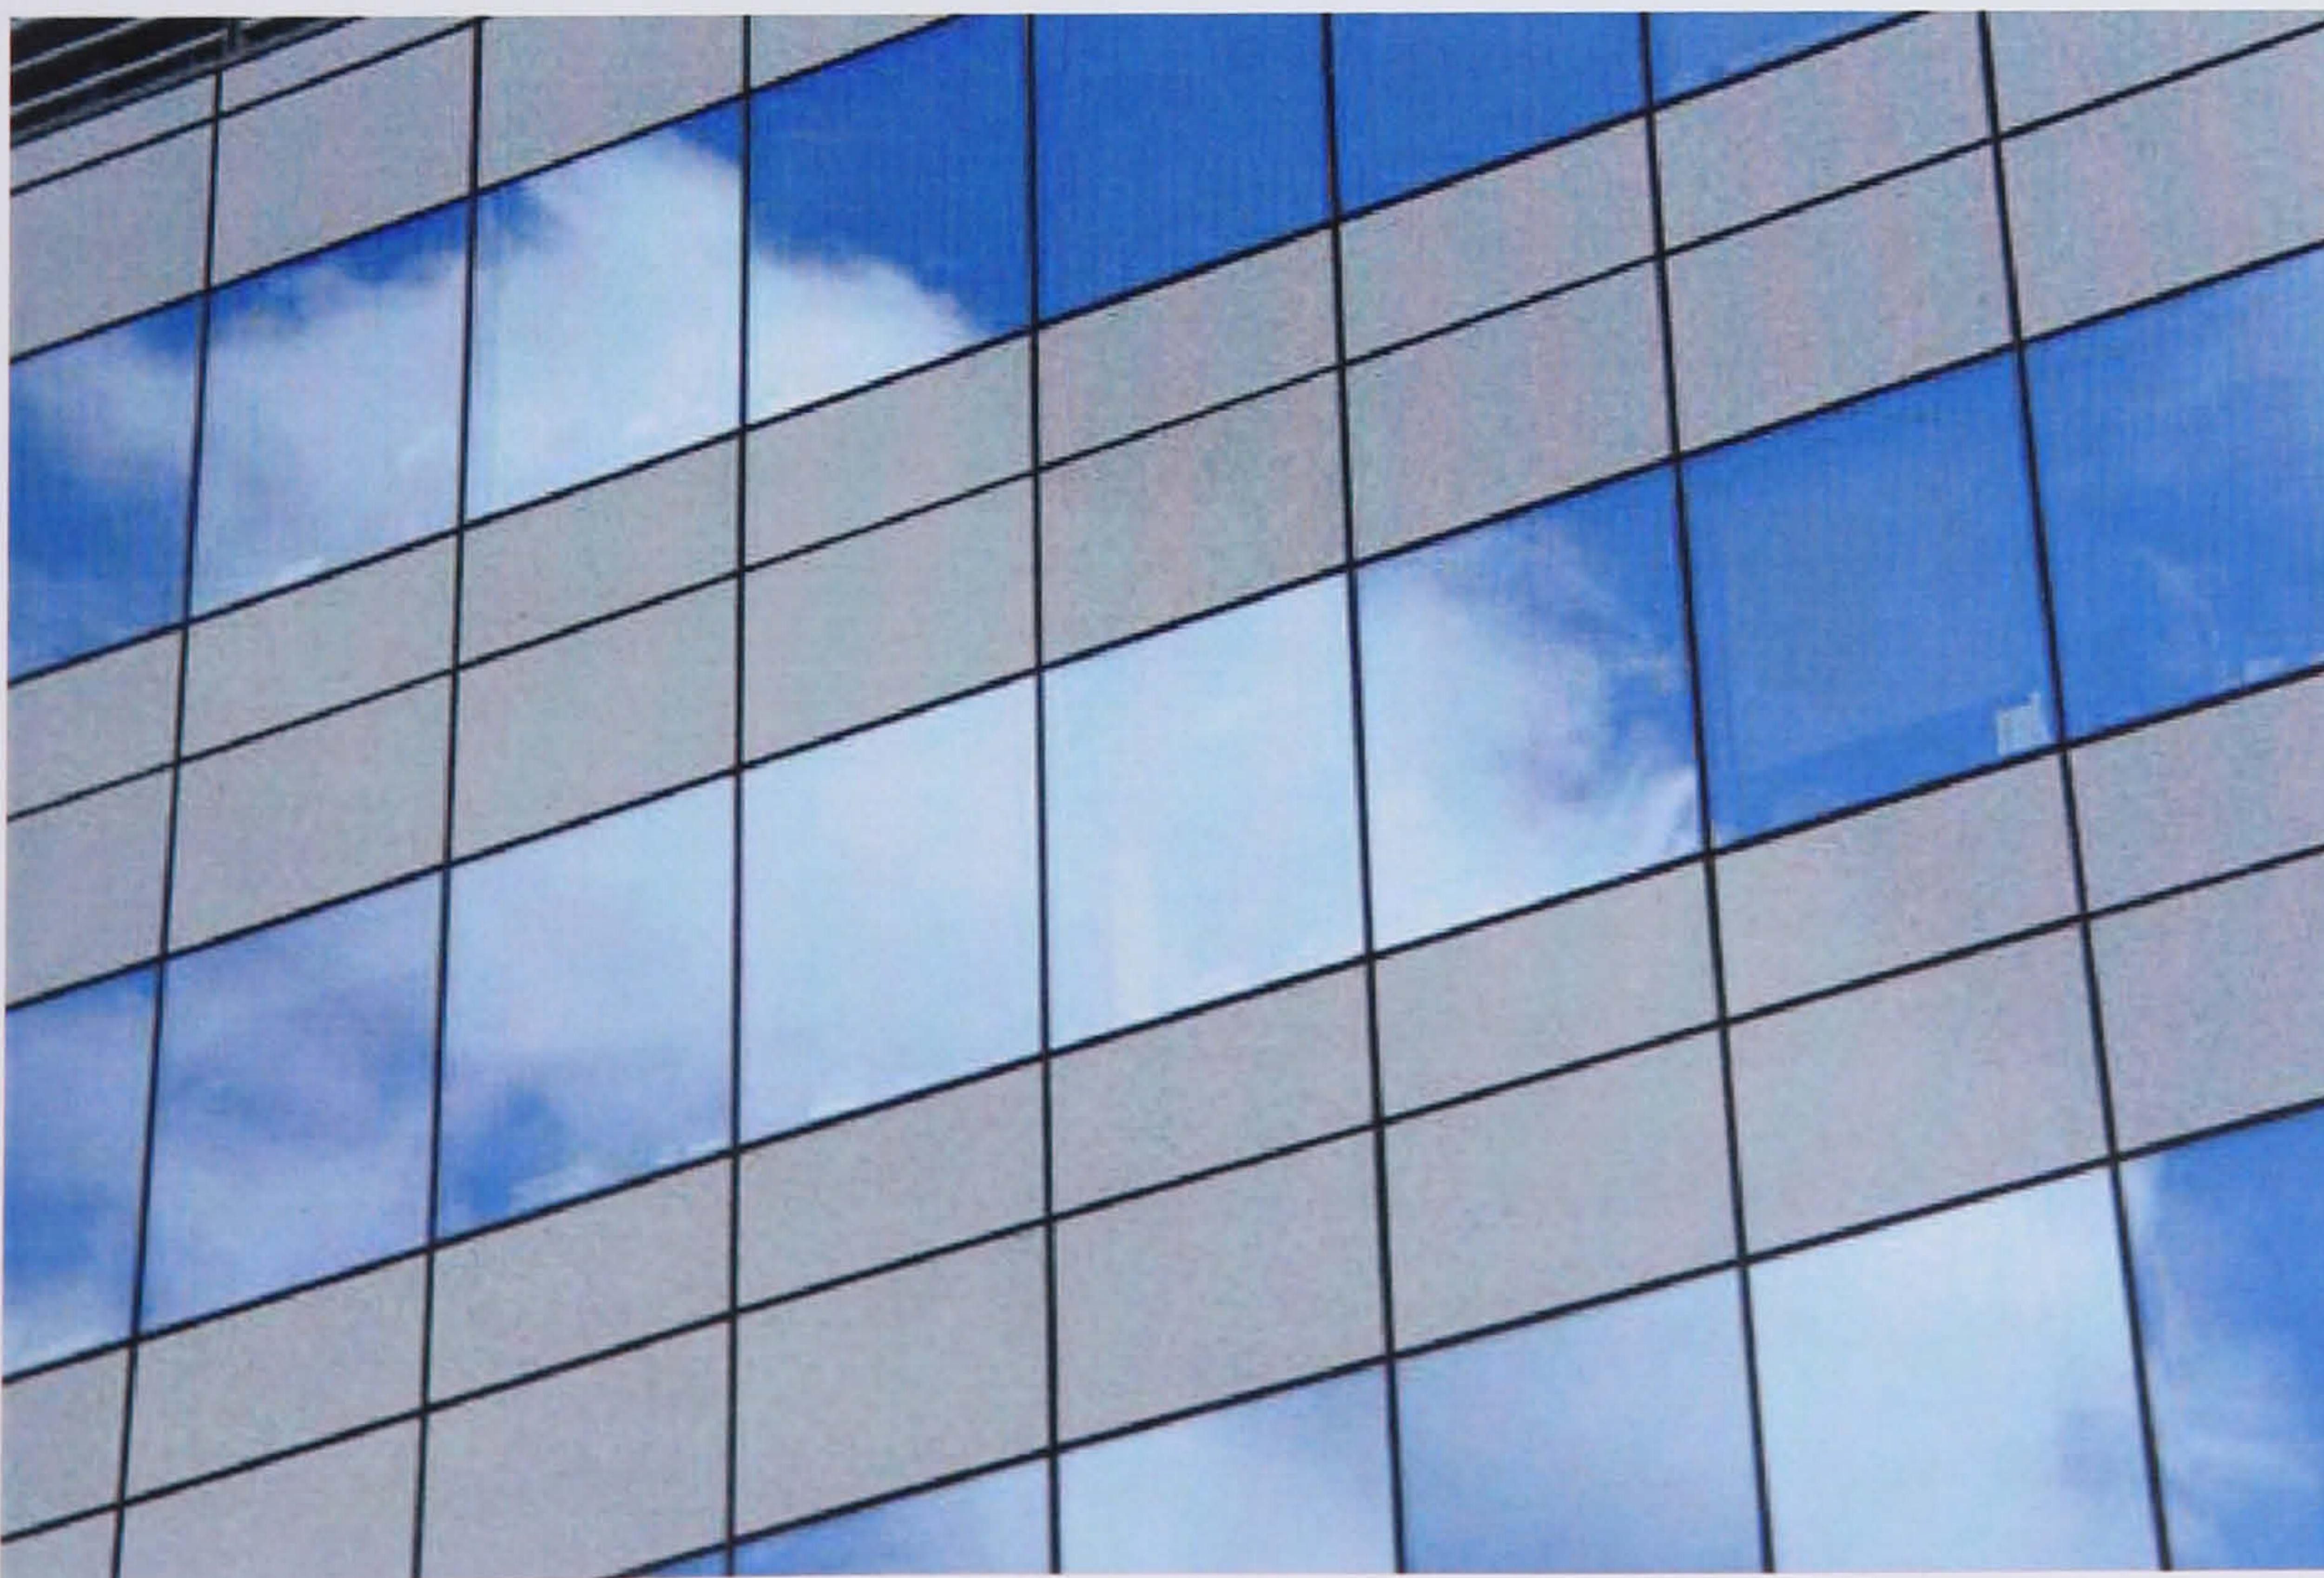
The north elevation of the Barbirolli Centre, Manchester.
